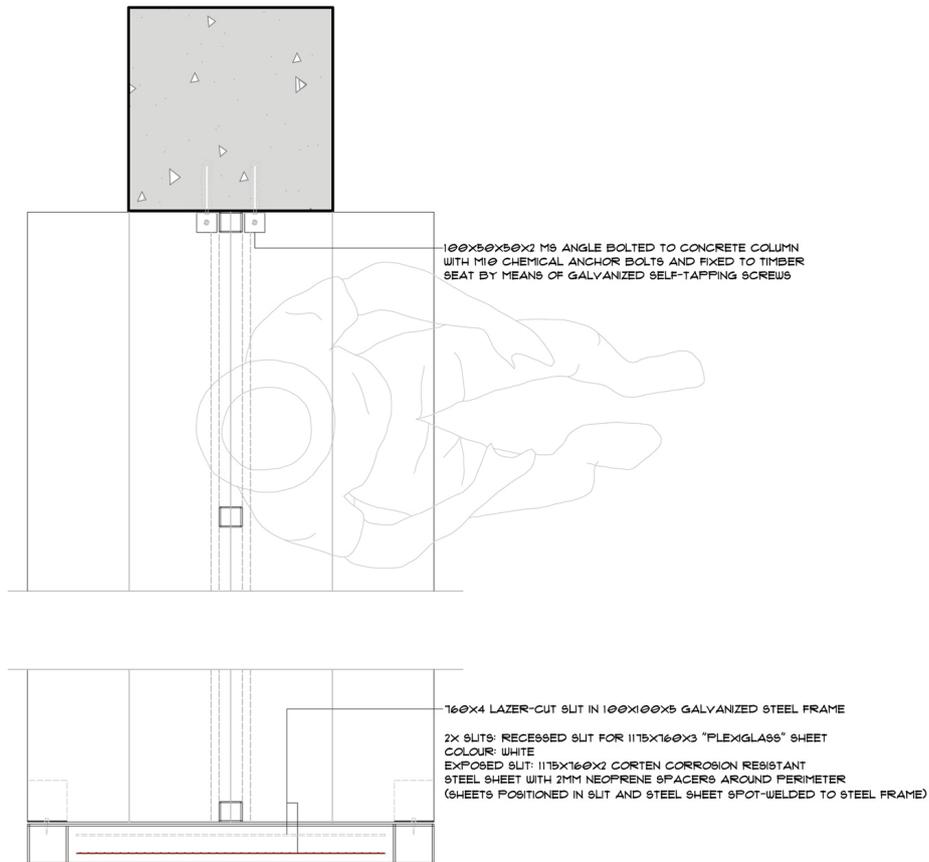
Threshold seating detail- not to scale_ November exam (Author, 2011).
